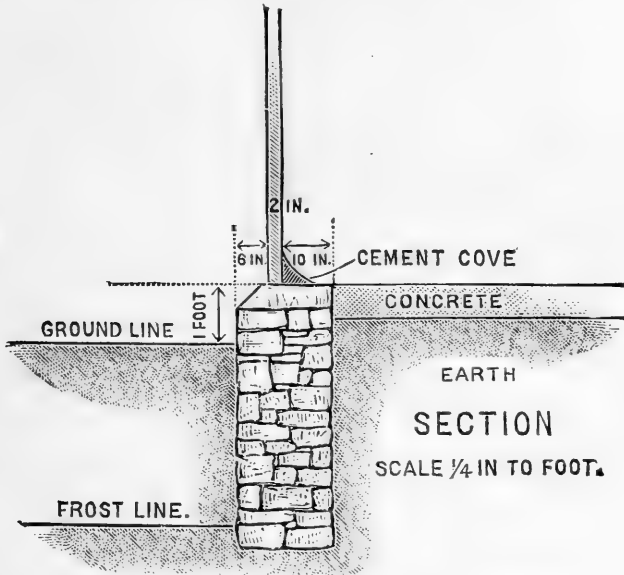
FOUNDATION OF STAVE SILO. (HARDER.)
